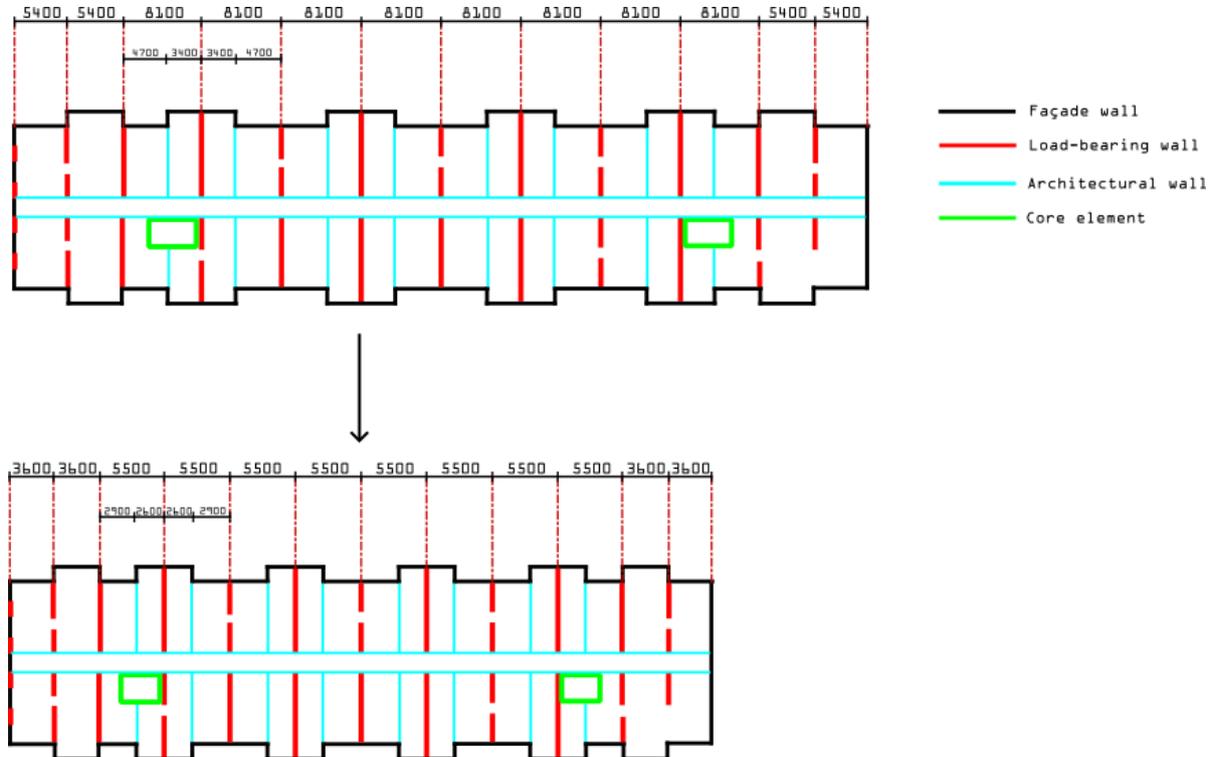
Example Solution for Changing Building Envelope to Reduce Floor Span
